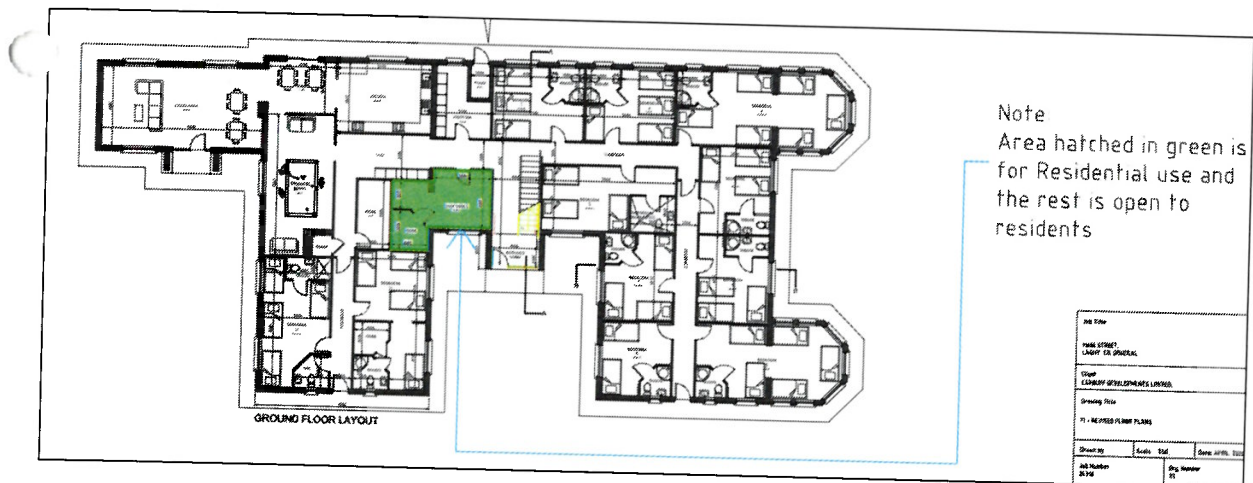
Ground floor plan of Atlantic Way B&B displaying the area allocated for a staff office (highlighted in green).
